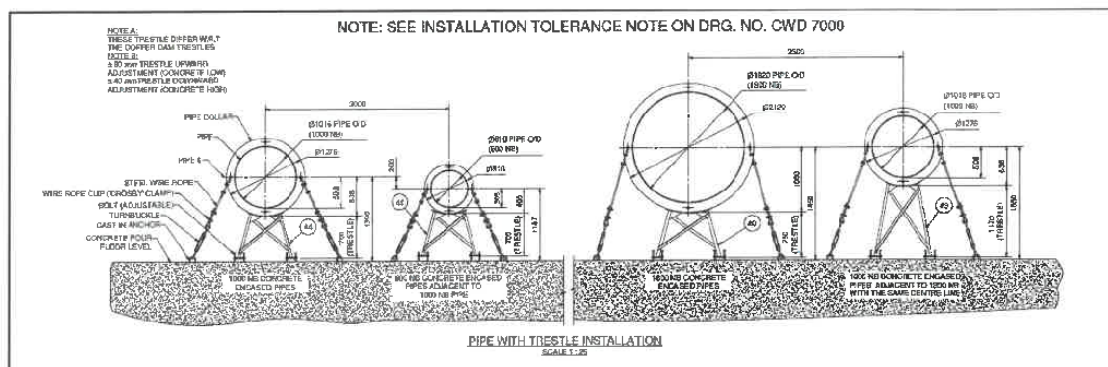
Installation of horizontal pipework (≥ 600 NB)
